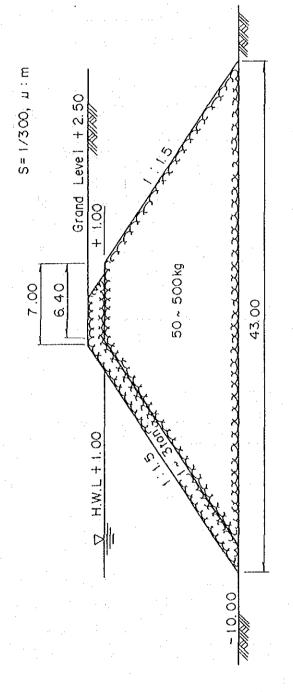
Typical Section of Protective Mound for Reclaimed Land
